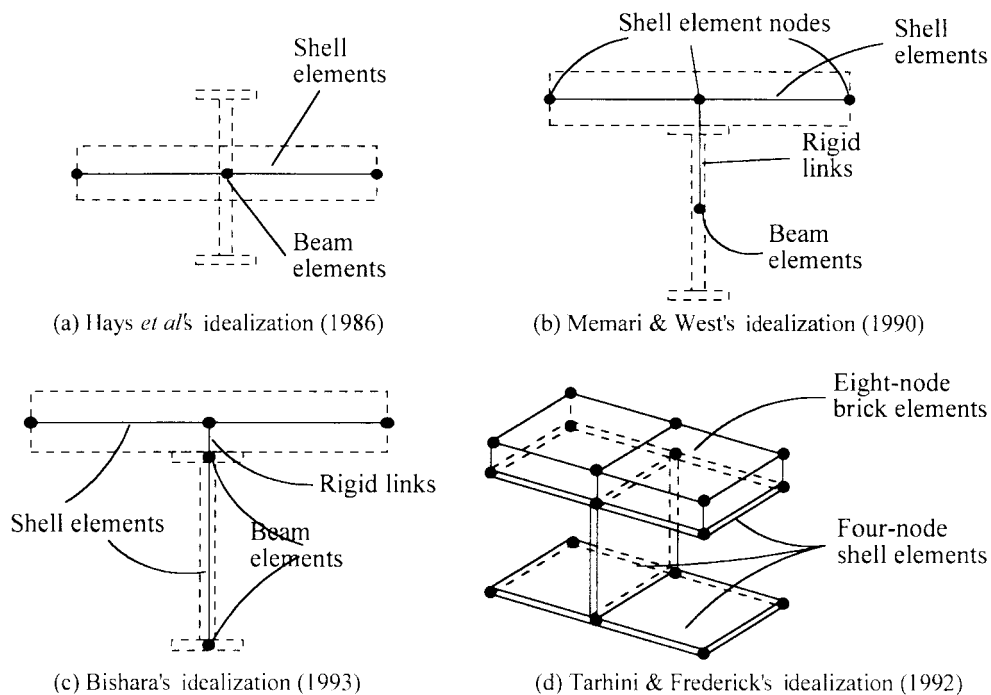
Typical finite element idealizations for slab-on-girder bridges
